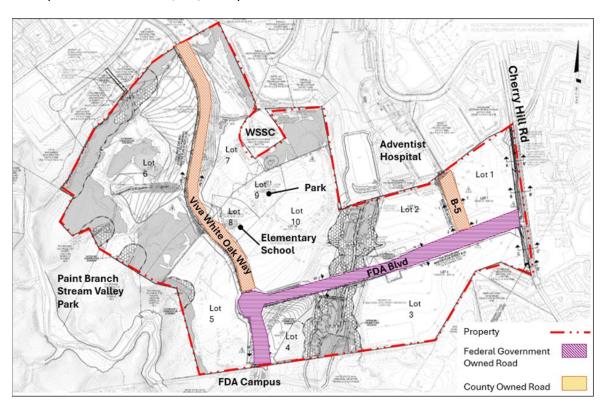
Preliminary Plan Amendment No. 120180240 and Public Road Ownership (all lots are illustrative)
